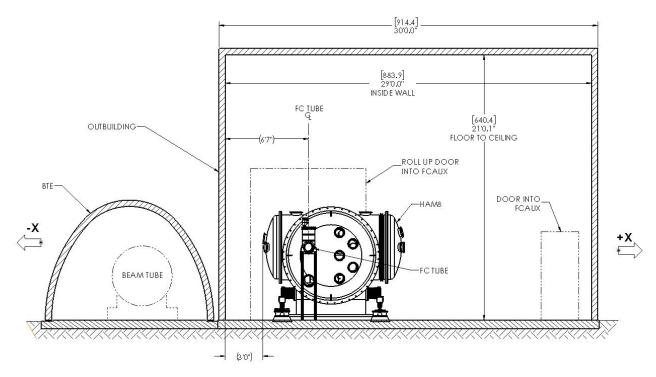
FCVEA internal elevation concept looking +Y global, showing existing BTE for orientation. Shelter to protect debris trap between BTE and building has been omitted for clarity. Dimensions and details subject to review.
